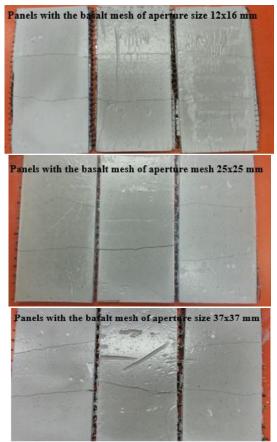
Bottom surface crack patterns of the plate specimens after the end of testing.
